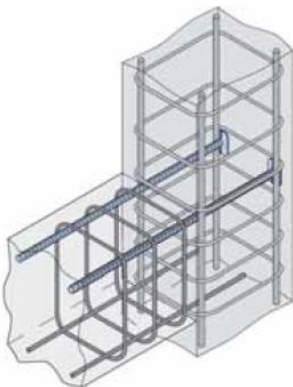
Type 1 stud connectors in an exterior beam-column joint
